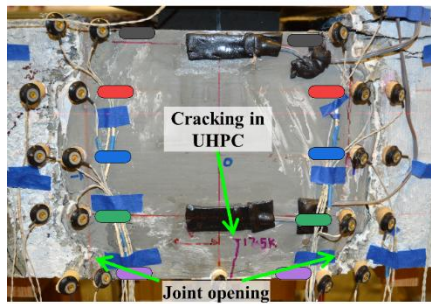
Measured LED joint opening and joint cracking of specimen Slab-SL-UH2
